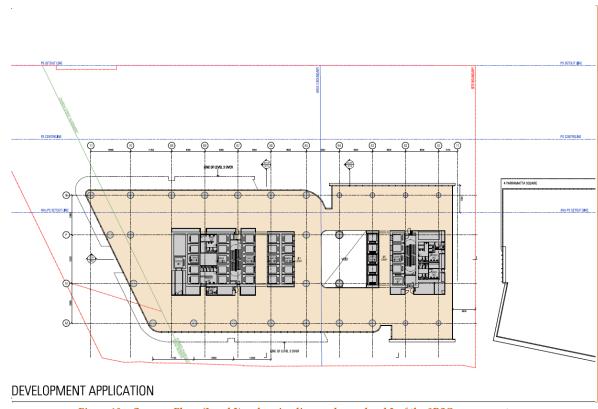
Campus Floor (Level 3) – showing linear edge on level 3 of the 8PSQ component
